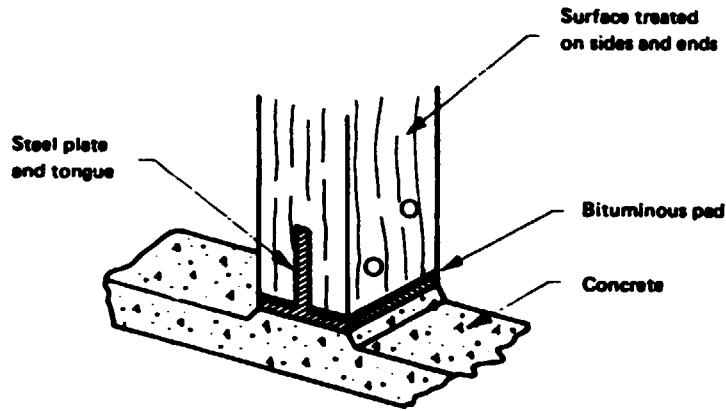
Isolation of wood column using a steel plate and a bituminous pad
